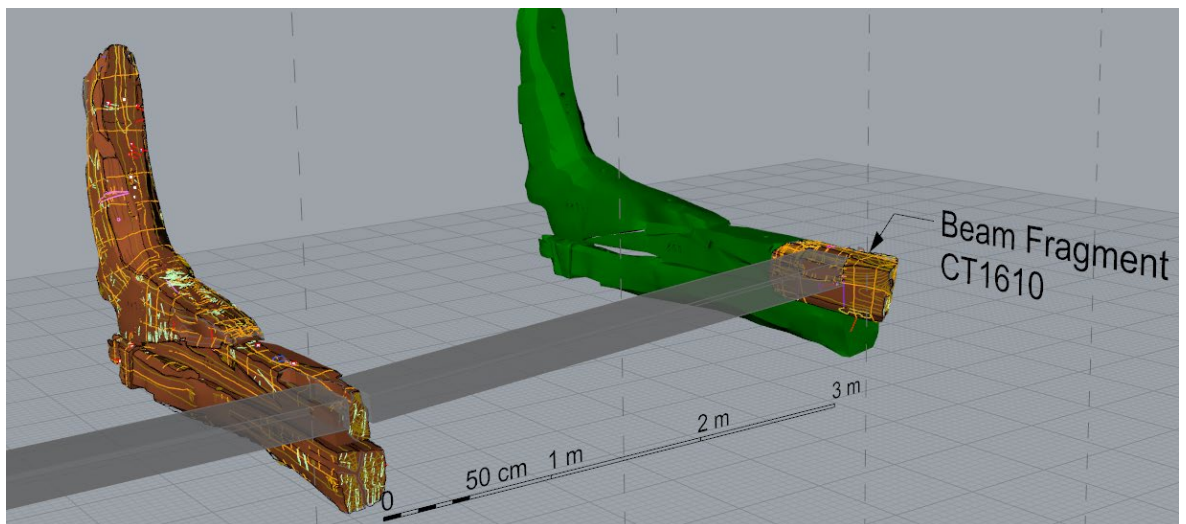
Composite beam and standing knee assembly with rebates for heavy carling beams (Pat Tanner)
